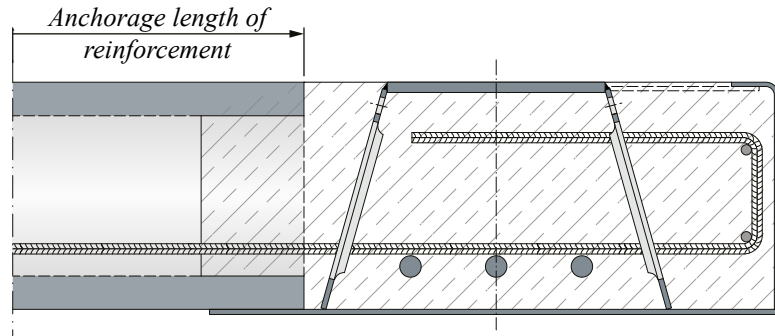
D-type DELTABEAM® used as an edge beam with transverse and ring reinforcement.
